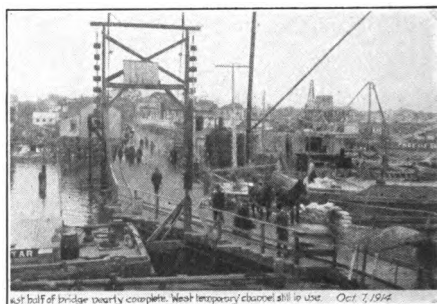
Washington Street Bridge, Norwalk, Conn.
